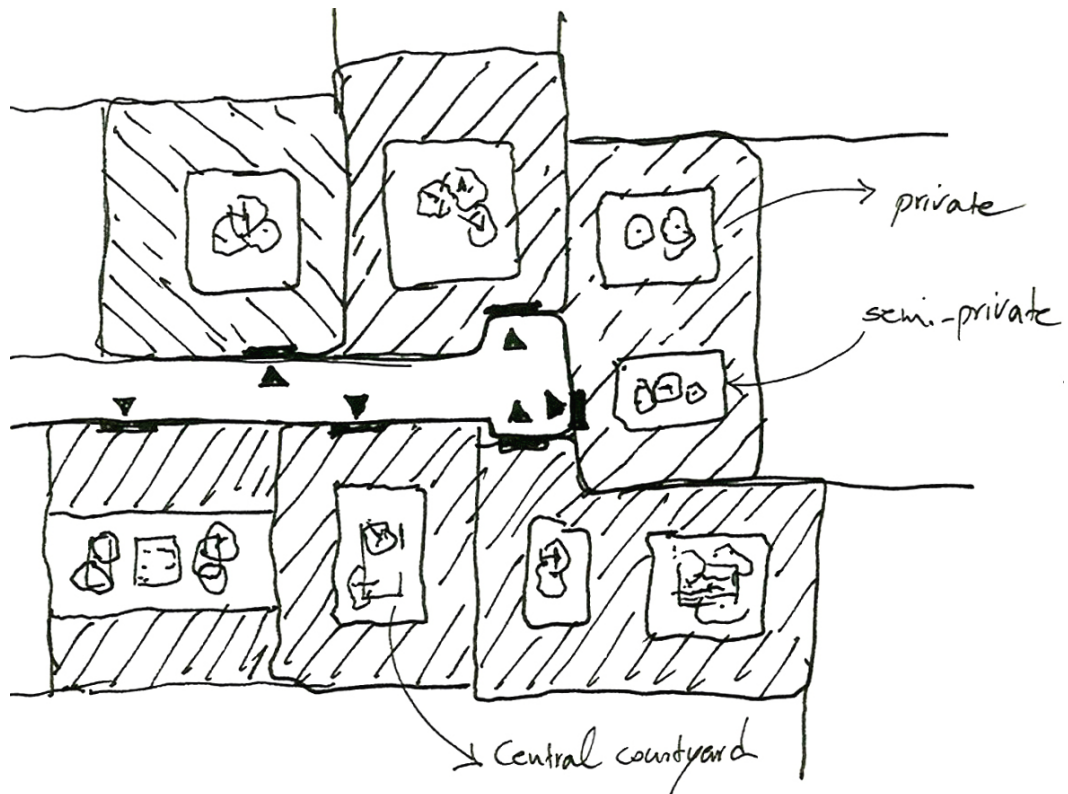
Sketch of a small scale housing layout organised around a bon-bast or cul-de-sac in vernacular city. The layout of larger houses was divided into two parts with a semi-private courtyard near the entrance door and a private courtyard deeper inside away from the entrance (source: Author 2013).
